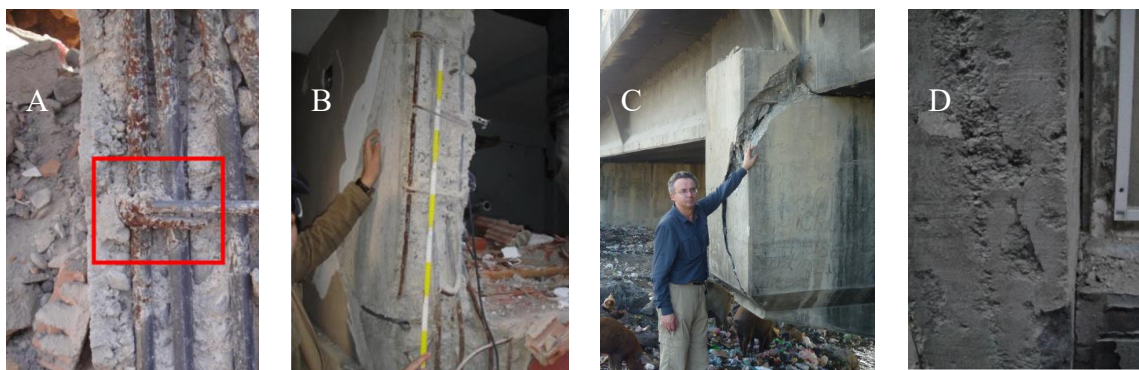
Common deficiencies of substandard RC buildings. A) improper hooking and use of plain bars, B) pull-out failure and C & D) low concrete quality.
